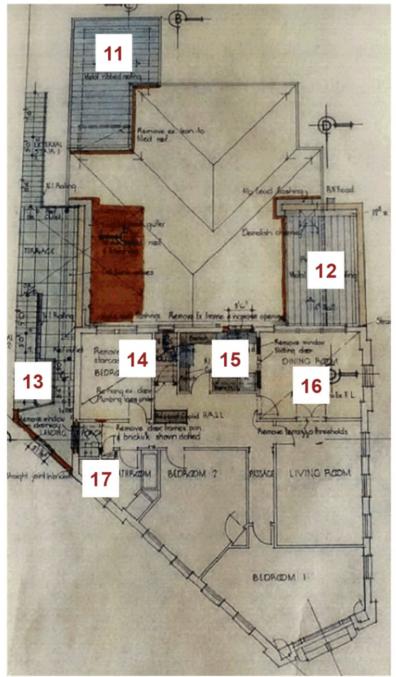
Ground Floor plan showing additions and alterations, 1963, by Spencer Hanson & Partners Architects Source: Westpac Archives
